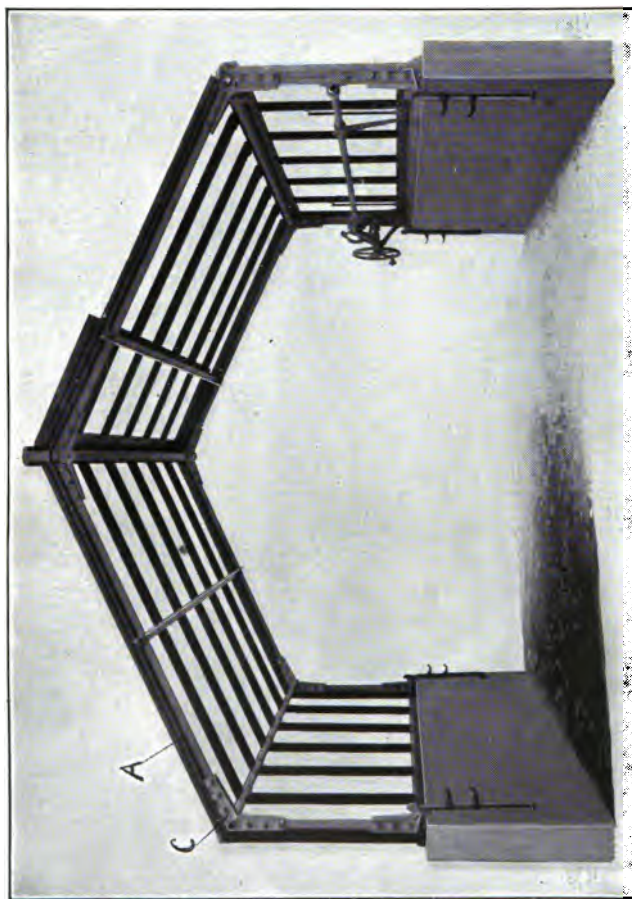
A type of all-metal, flat-raft construction. A, rafter; C, gusset plate.
